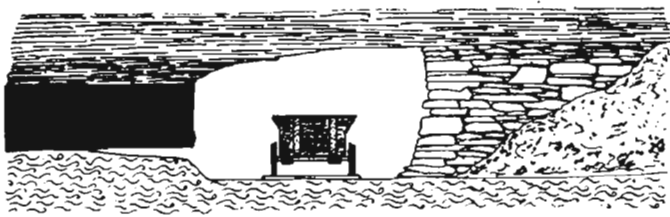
Section at face in long wall mining with strong roof, showing position of track, gob wall, etc.
